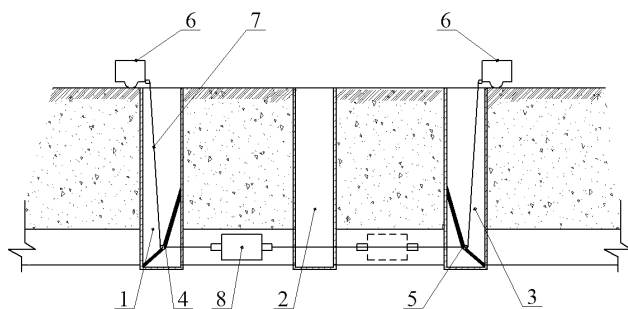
The method of sewer cleaning: well 1; well 2; well 3; thrusts 4; pulleys 5; winches 6; rope 7; metal bucket 8
